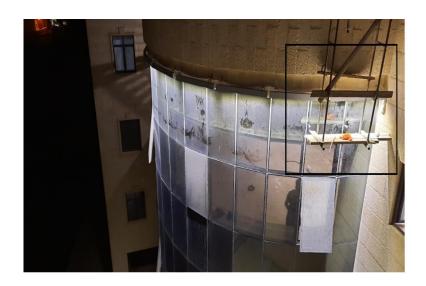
12: Dangerous Scaffold used to install Outdoor Lighting Fixtures for the building³⁹⁷
